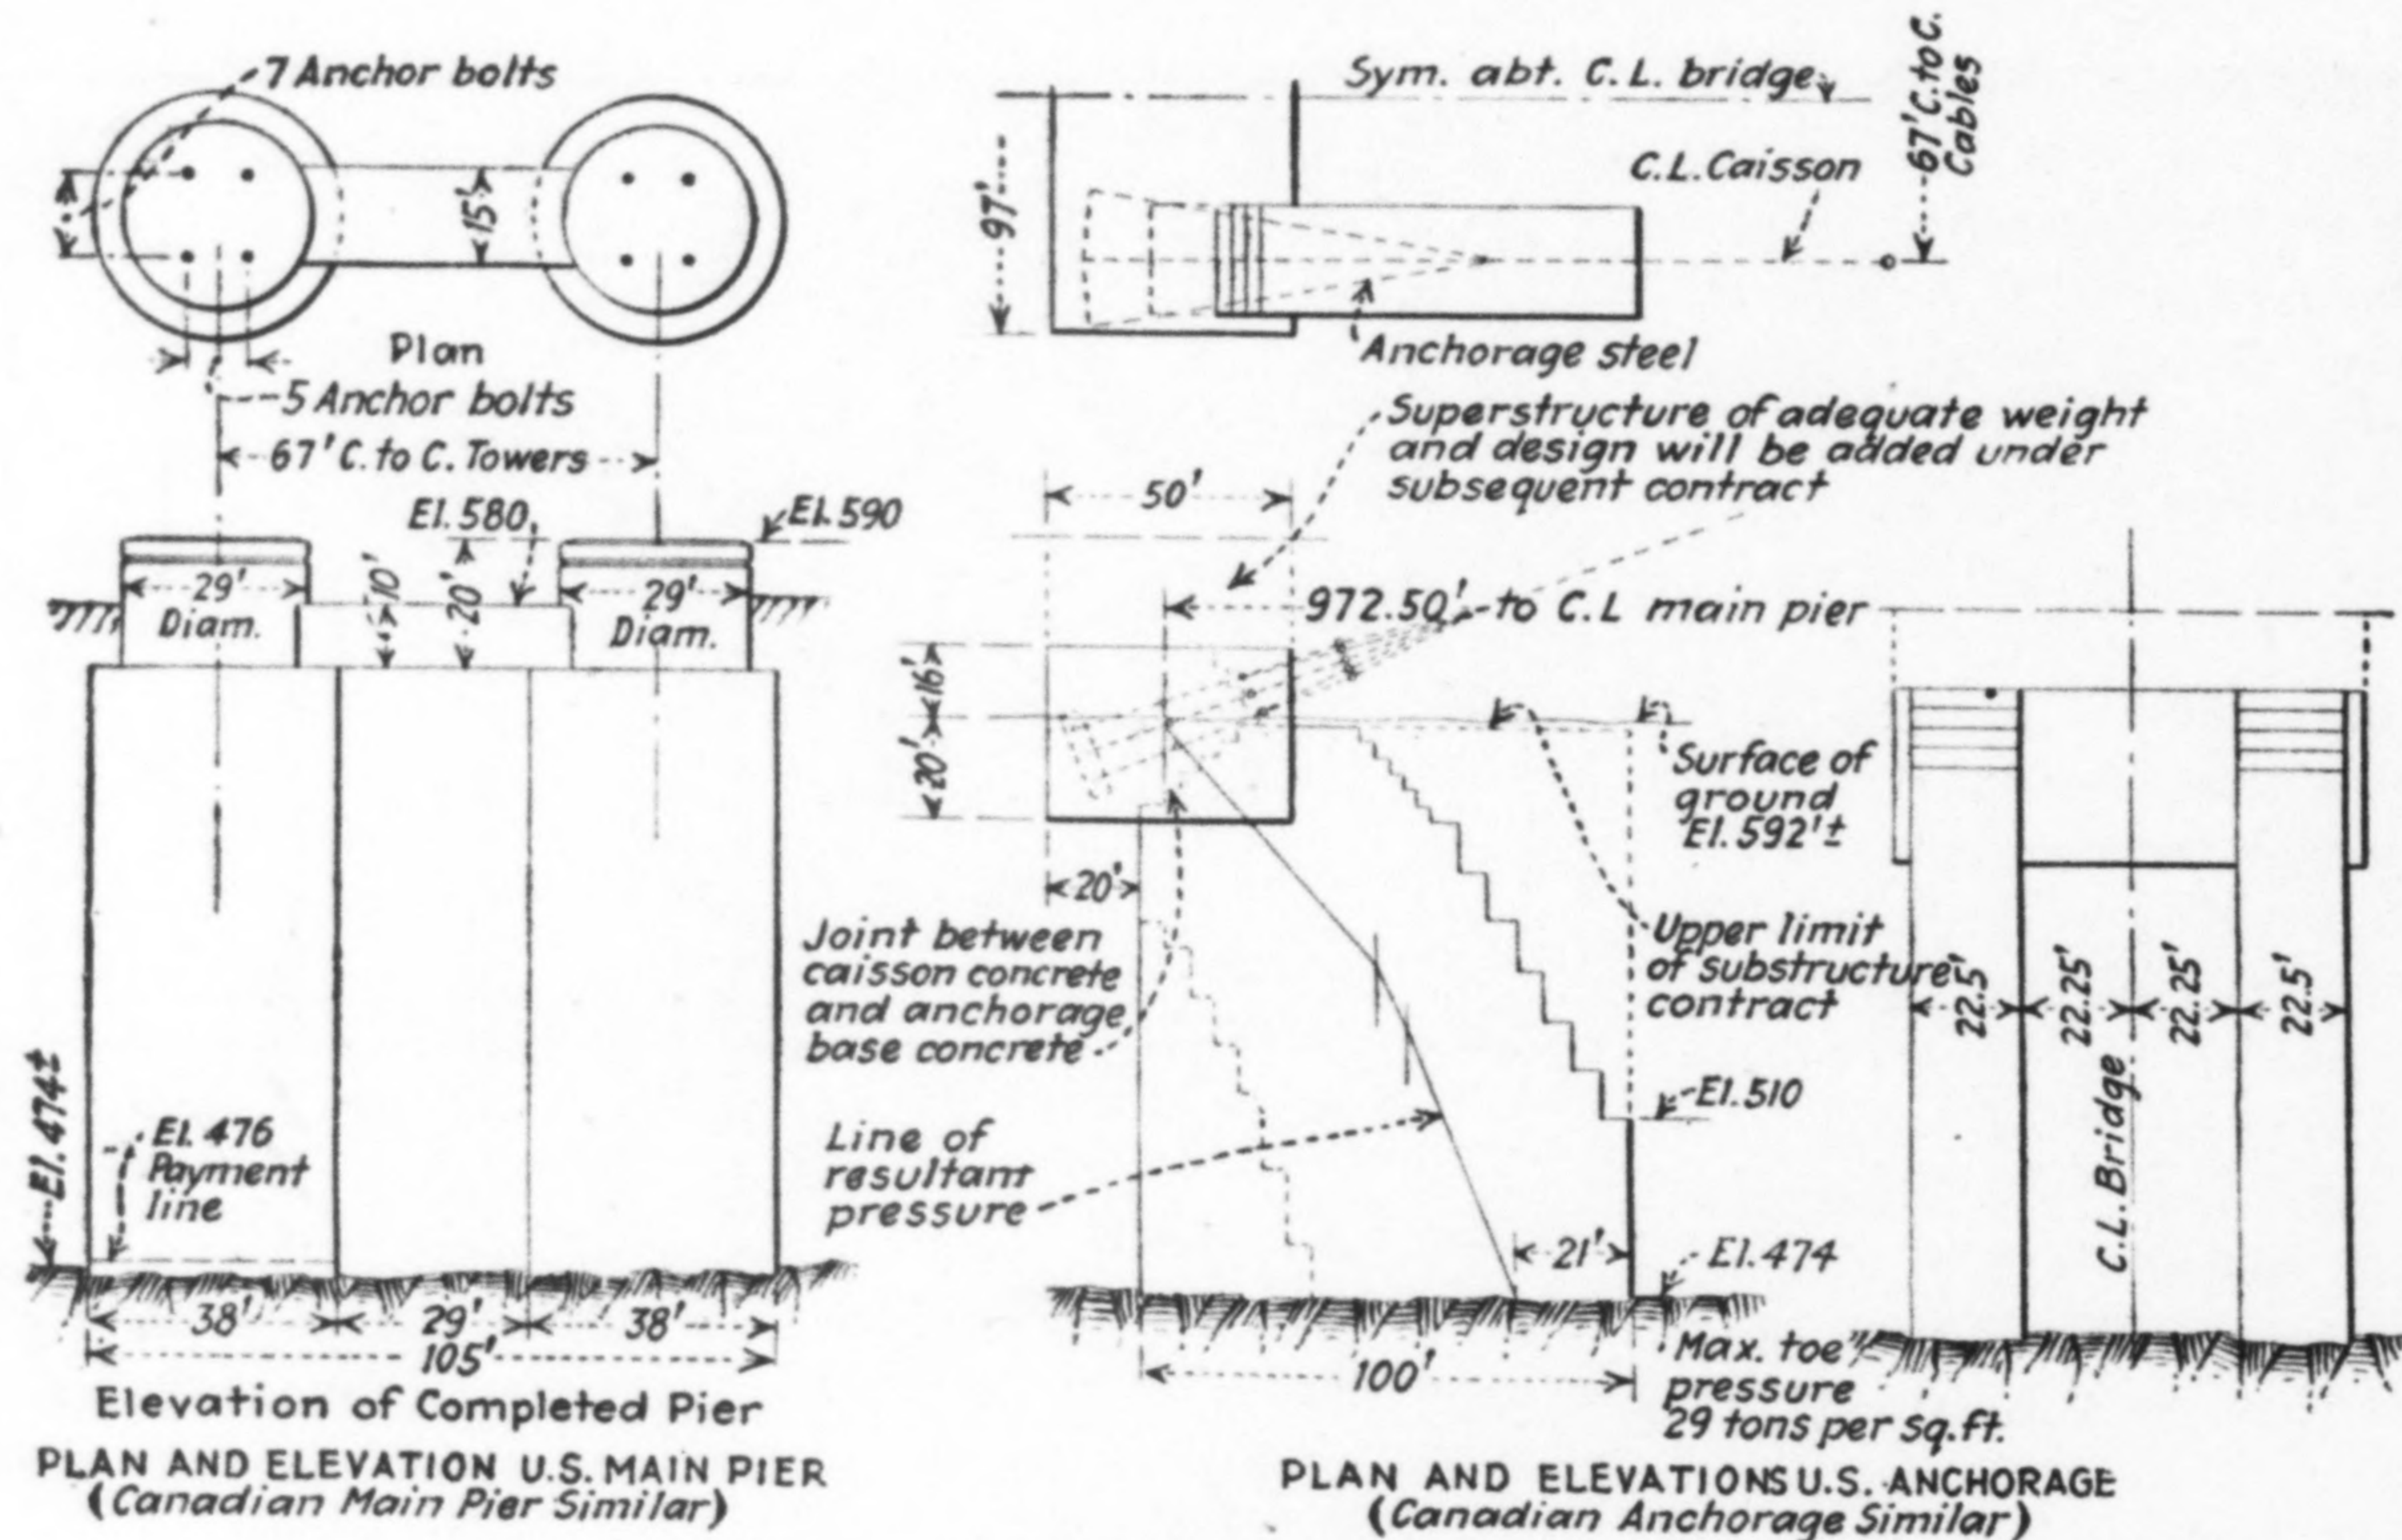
DETAILS OF MAIN PIERS AND ANCHORAGES
